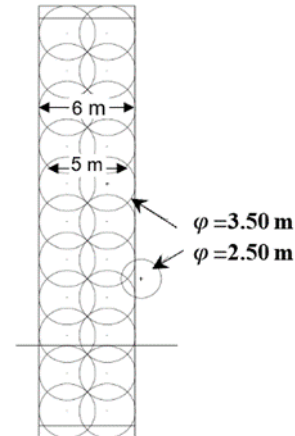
Design plan of the jet grouted preceding beam (Block F)
